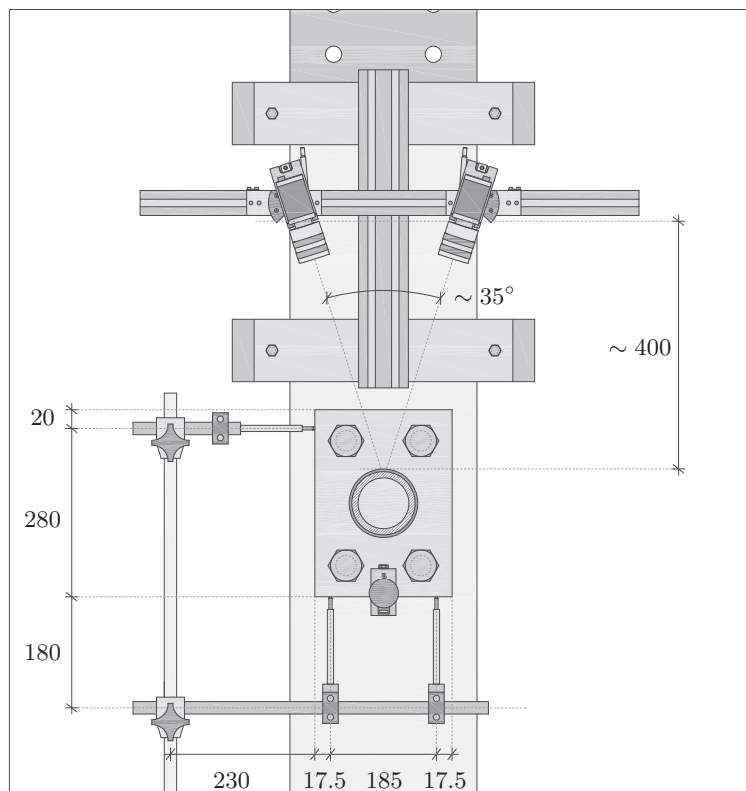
Tube to plate test setup - front view cut just before tube inclinometer
